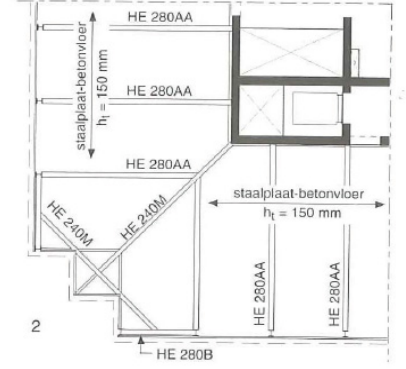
Floor system Rembrandt Tower (Overspannend Staal, B)
